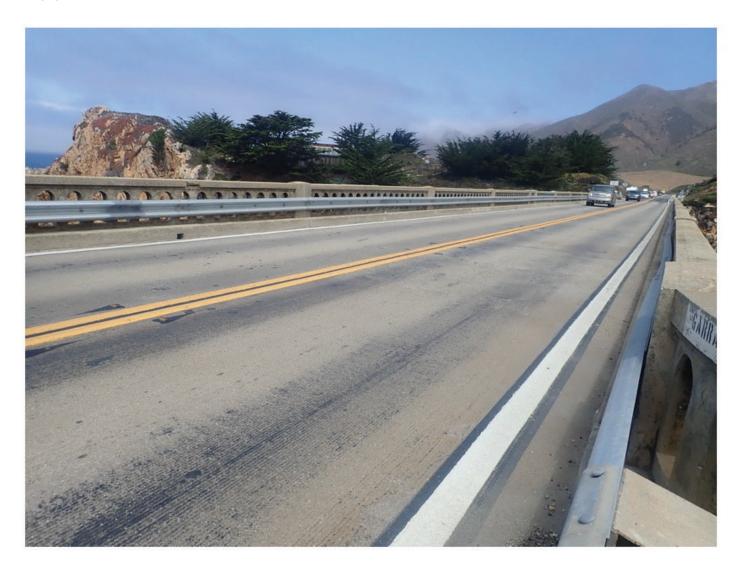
Thrie beam installation at the interior of both bridge rails (shown from Abut. 1, right).
